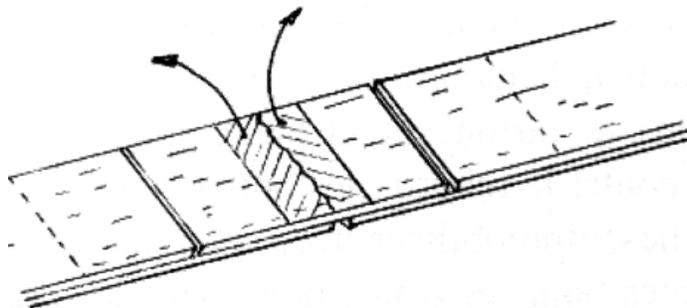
Both arrows indicate the parts of the damaged book to be removed.
